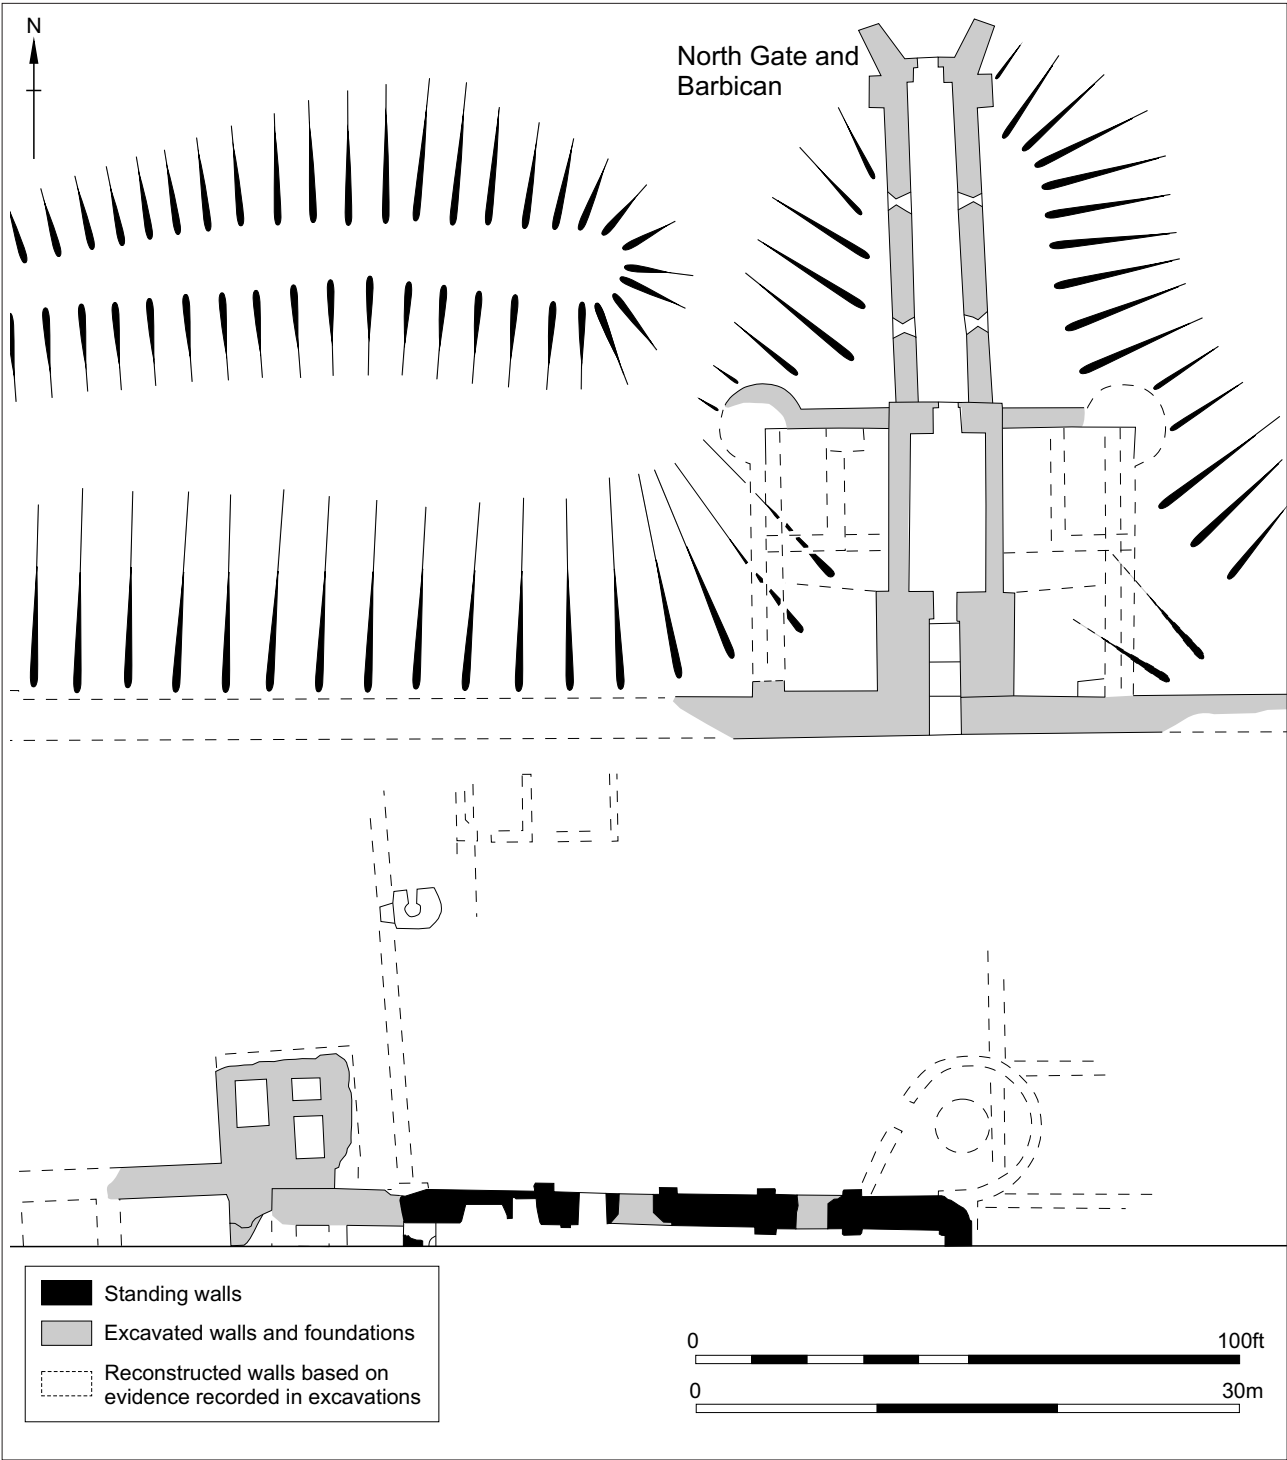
The structures between the north side of the central buildings and the north length of the curtain wall, excavated by Bean. Plan: after C E Bean's plans dated August 1946
